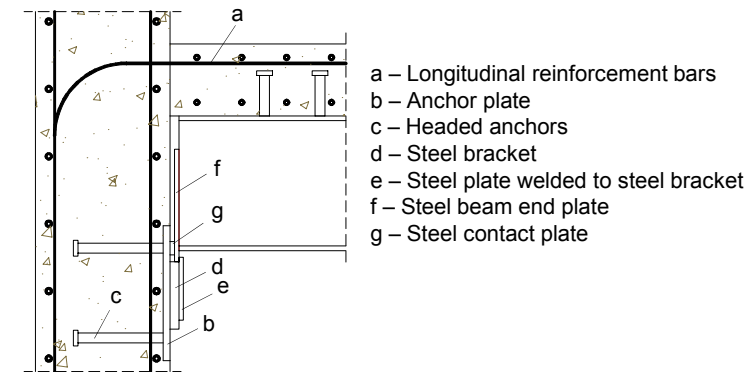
Composite beam to reinforced concrete wall joint configuration studied in [1]
